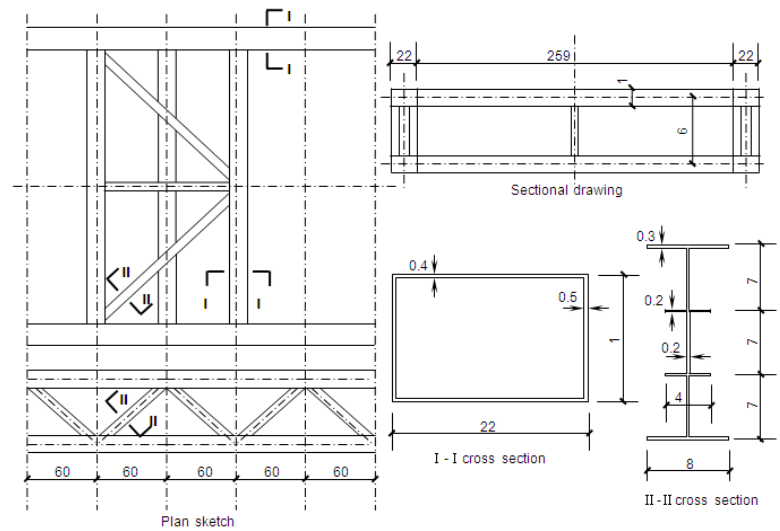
Wind tunnel model of cross section of main arch lib (Unit:mm)
